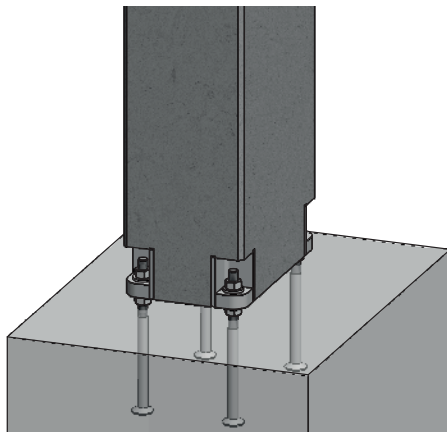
TYPICAL PRECAST COLUMN CONNECTION [8]
